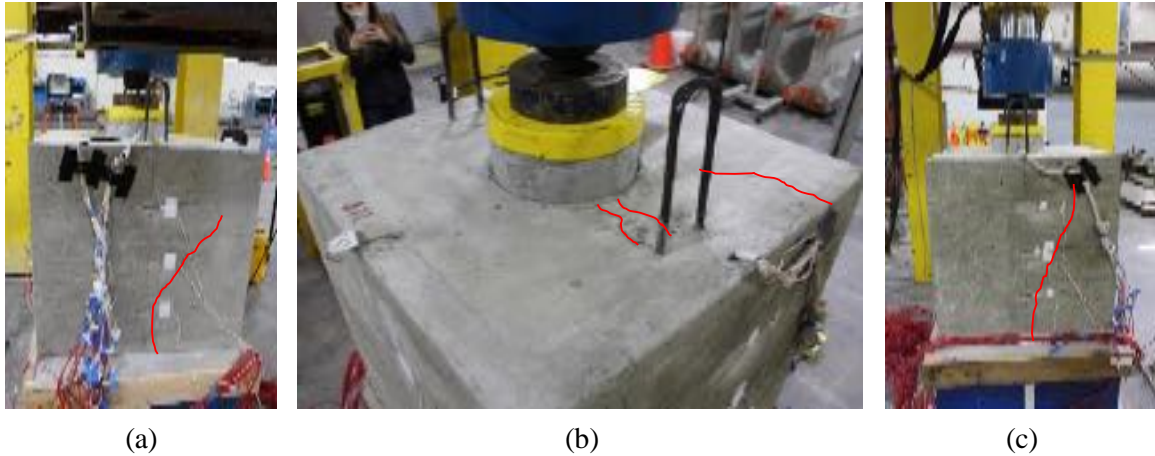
Cracking on the (a) east, (b) top, and (c) west faces of Specimen S1-4 after failure. This cracking in the specimen occurred before the plug began to slide but suggests that the plug caused expansion of the cap prior to it pushing through. The confining steel in the cap also appears to have engaged during the sliding of the plug, shown in Figure A - 18. The confining reinforcement was engaged along the same plane as the cracking, shown by RSB-PCE5 and RSB-PCW5 both showing large increases in strain.
